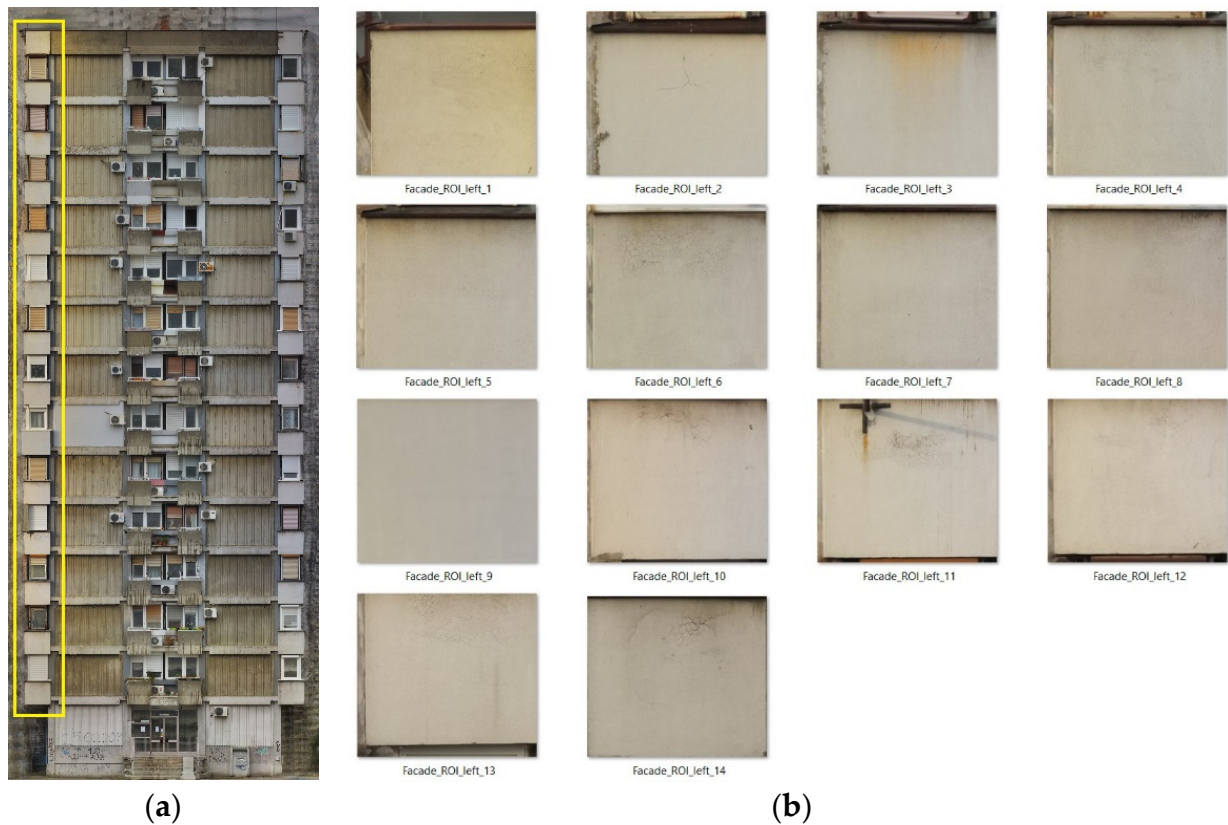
First step of crack detection—extraction of façade elements from orthofaçade image. (a) Façade elements selected for analysis; (b) the extracted individual blocks represented by rasters in the directory structure.
